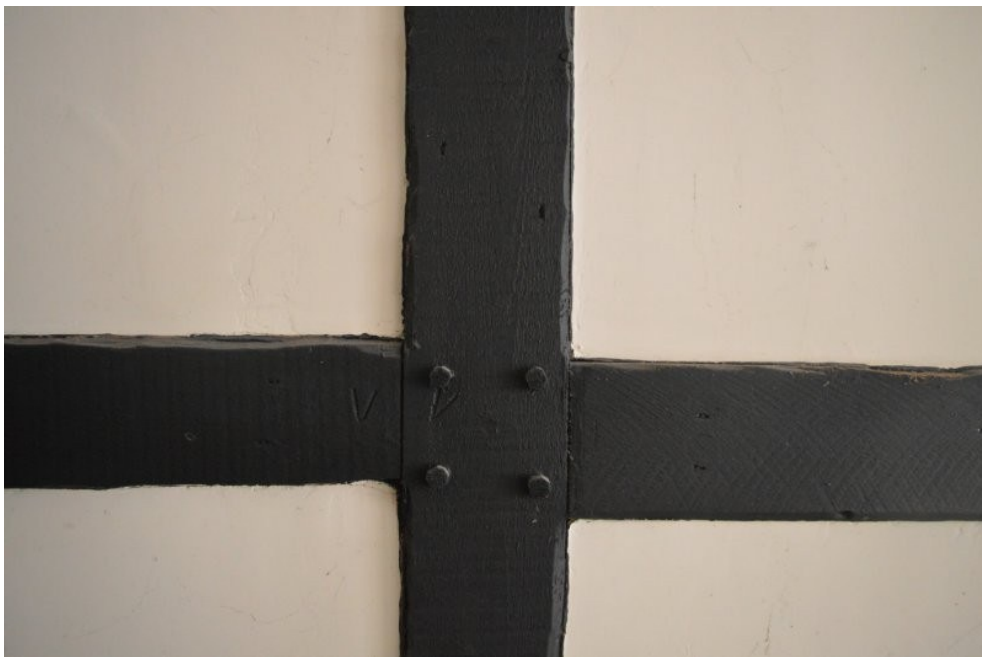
Carpenters' marks in box framing, south wall of Room 2
